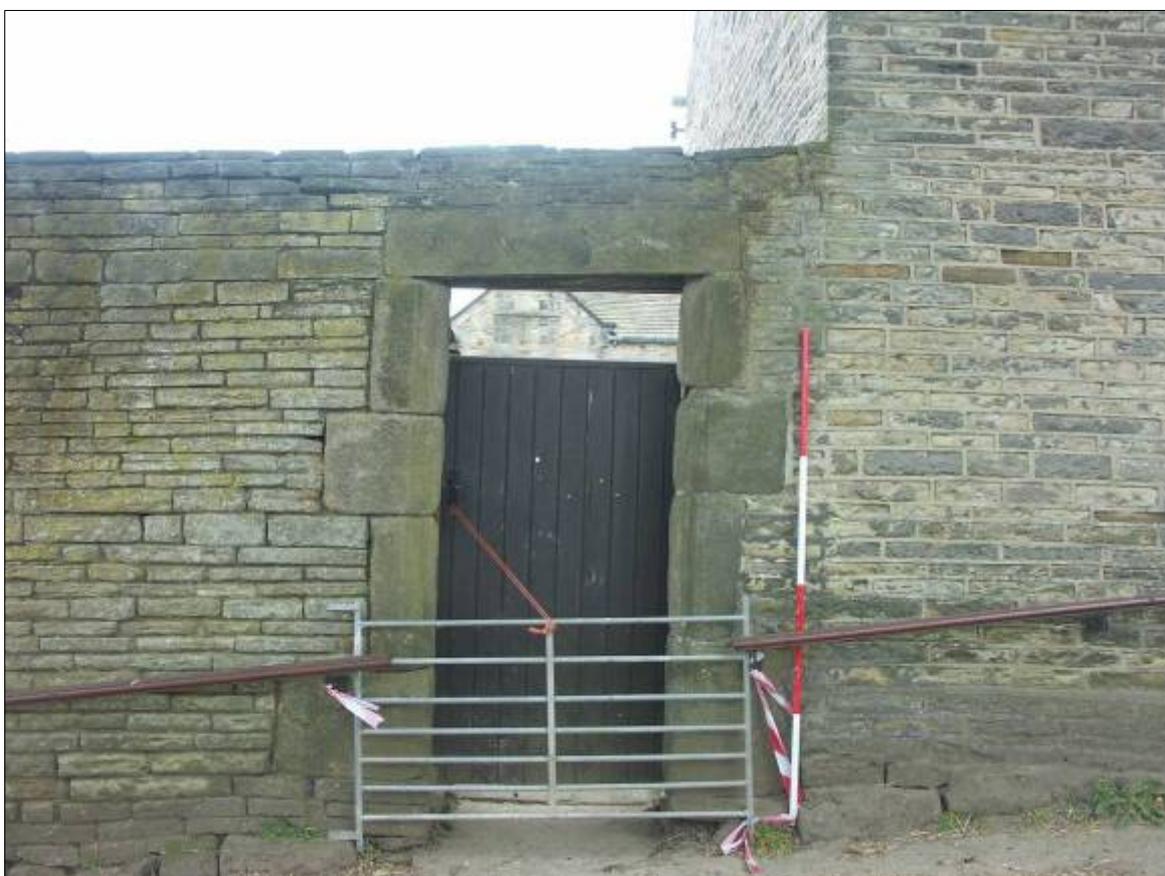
North elevation of Building Q showing inserted moulded doorway leading to the top yard.
